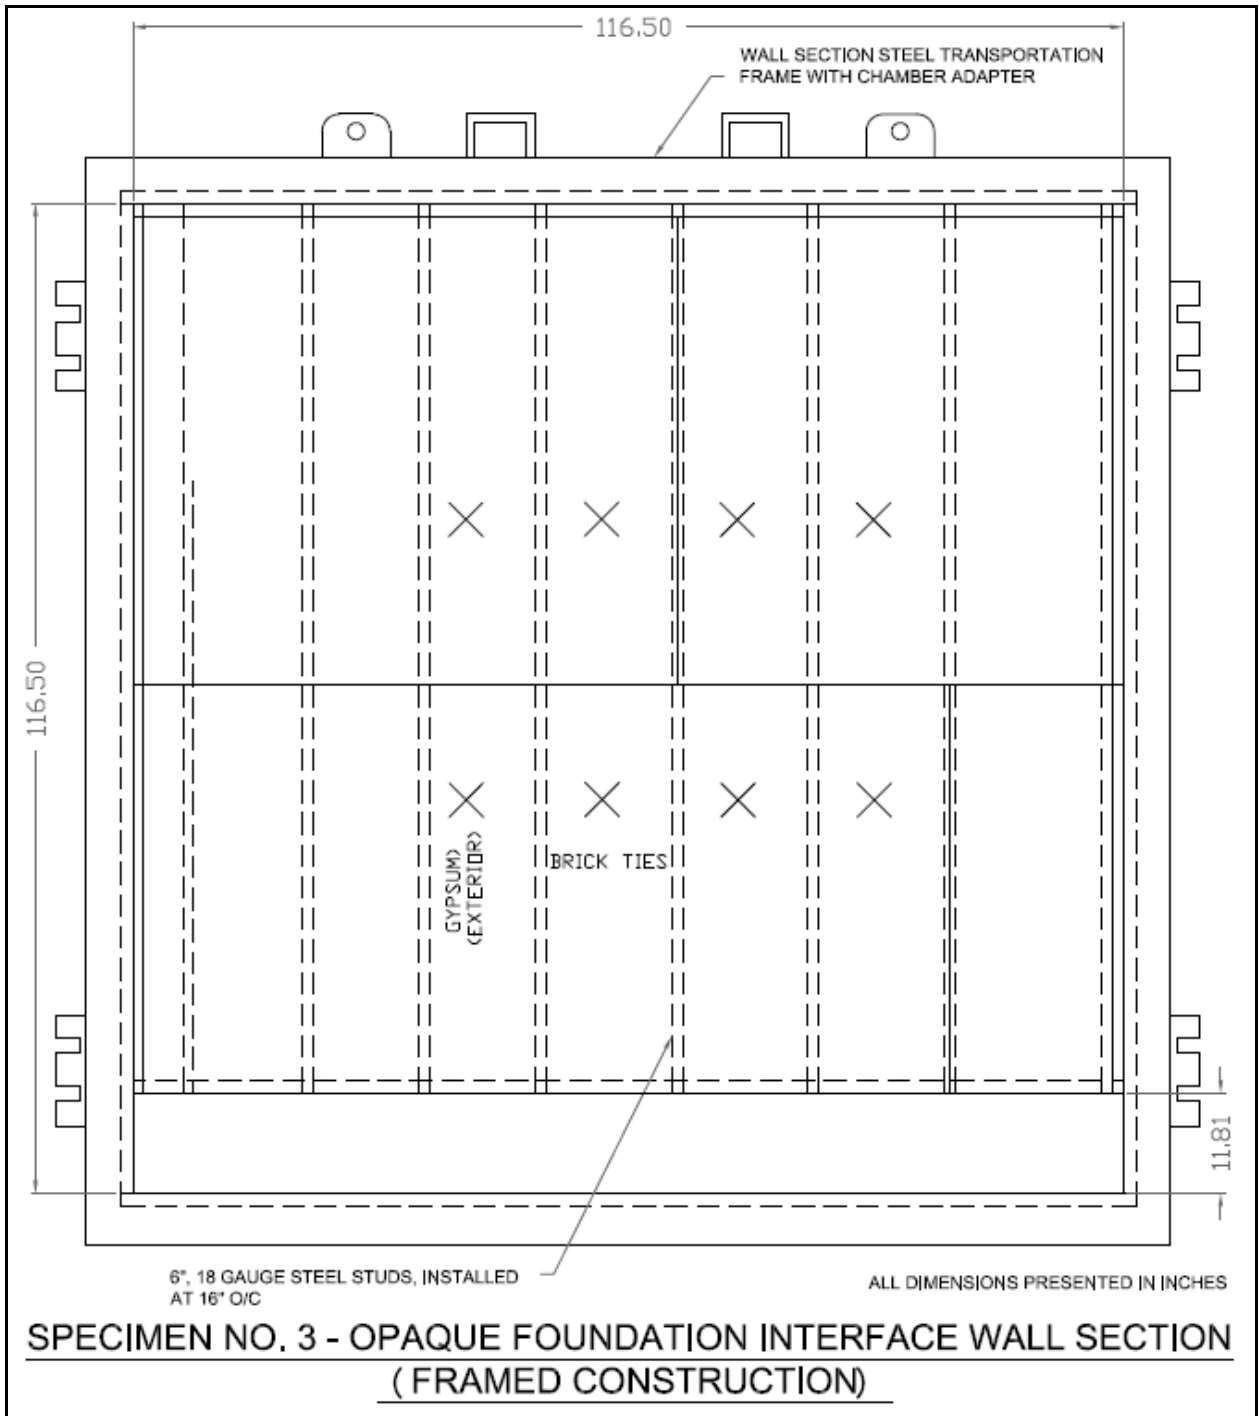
Element Specimen 20-06-B0040-SS-CB-3 Gauge Locations
